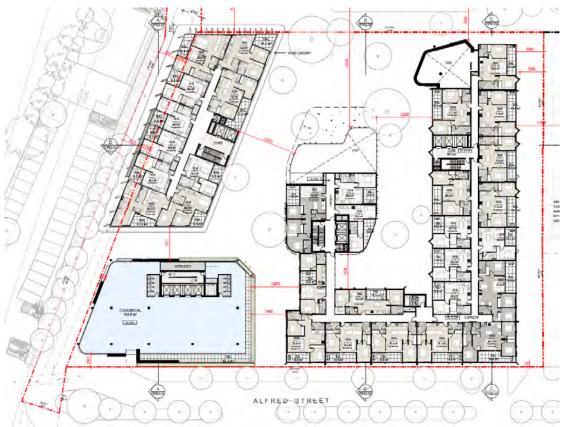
Level 1 layout illustrating internal layout and typical setbacks
